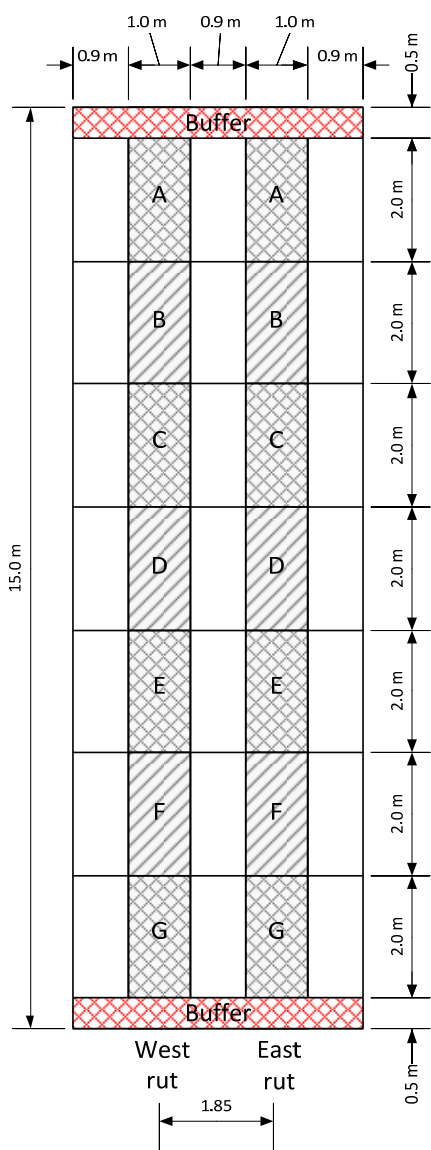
Measurement layout and plans for field soil tests within a single test section.
